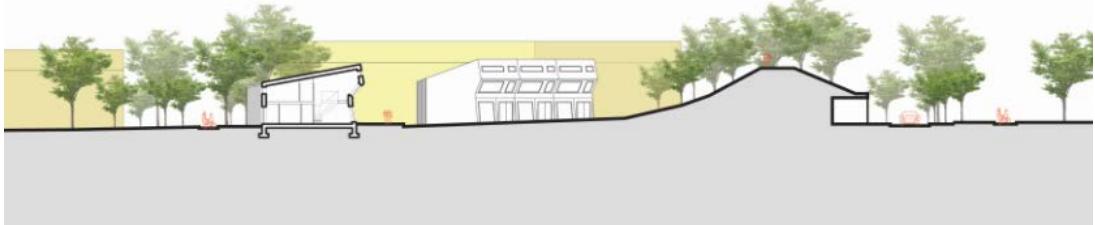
, Section through the site plan, with garages in the southern slope of the hill
